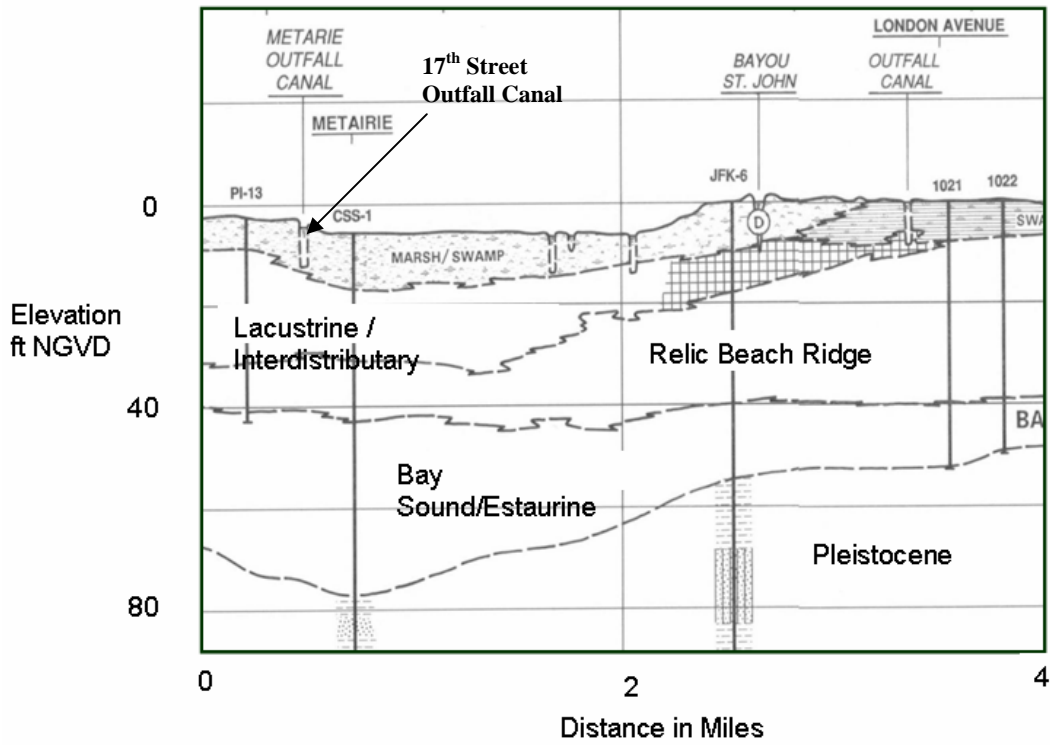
Cross section of 17<sup>th</sup> Street Outfall Canal with foundation conditions extending west to east across eastern Jefferson Parish and into western Orleans Parish (IPET 2007)
